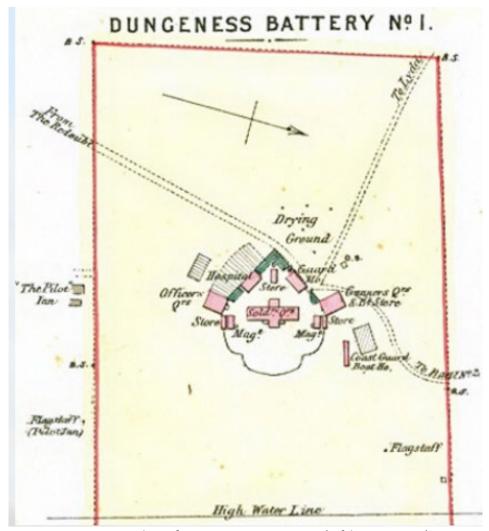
Plan of No. 1 Battery in 1867 (Fifth Continent)
